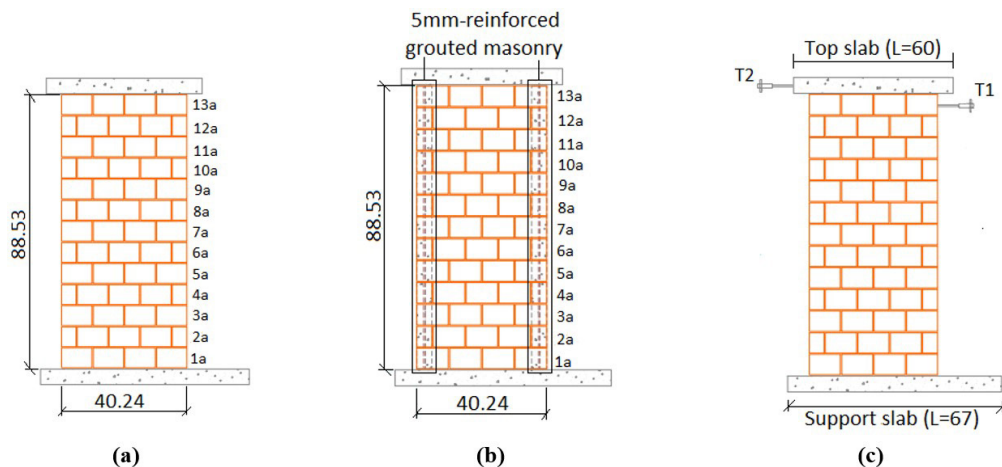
Individual shear wall (dimensions in centimeters). (a) PISG1 Wall; (b) PICG1 Wall; (c) Displacement measurement locations. (Source: adapted from Nascimento [2]).
